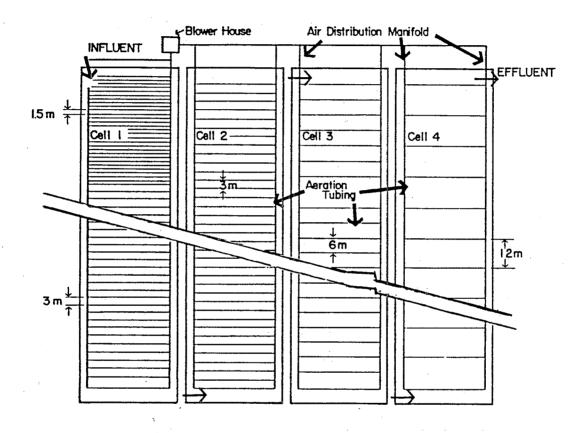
LAYOUT OF AERATION SYSTEM FOR PARTIAL MIX DIFFUSED AIR AERATED POND SYSTEM.
